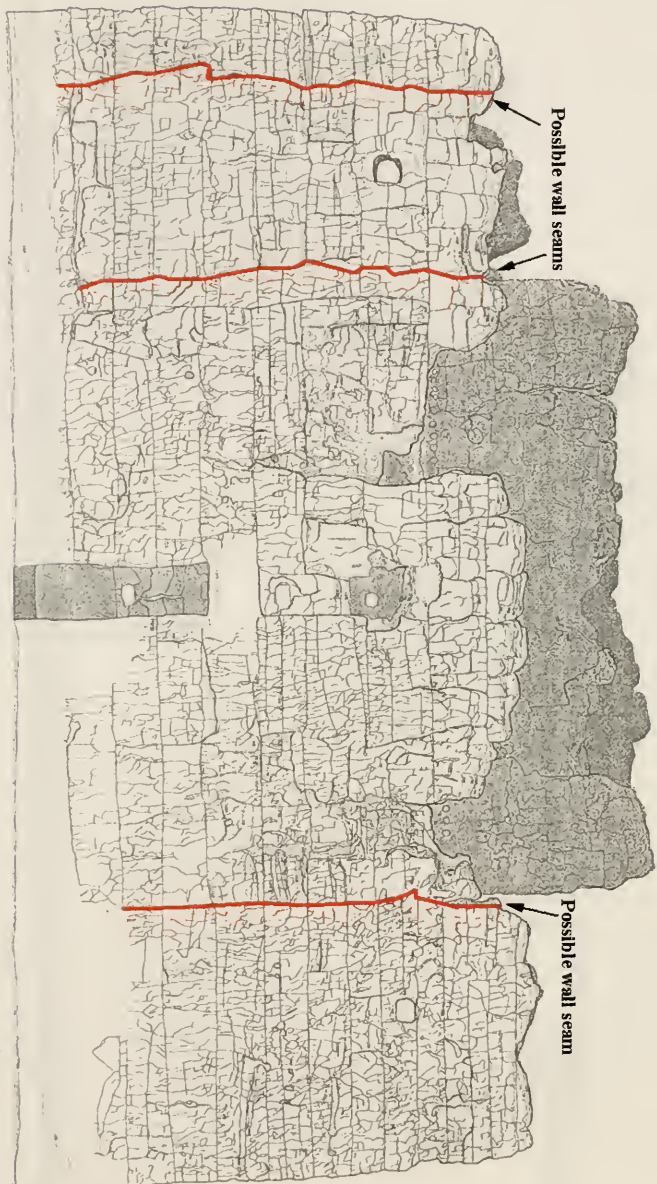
West elevation with evidence of tier construction (Myra, P and E. Borchers, Terrestrial photogrammetry of the Great House, 1979. Courtesy Casa Grande Ruins National Monument)
